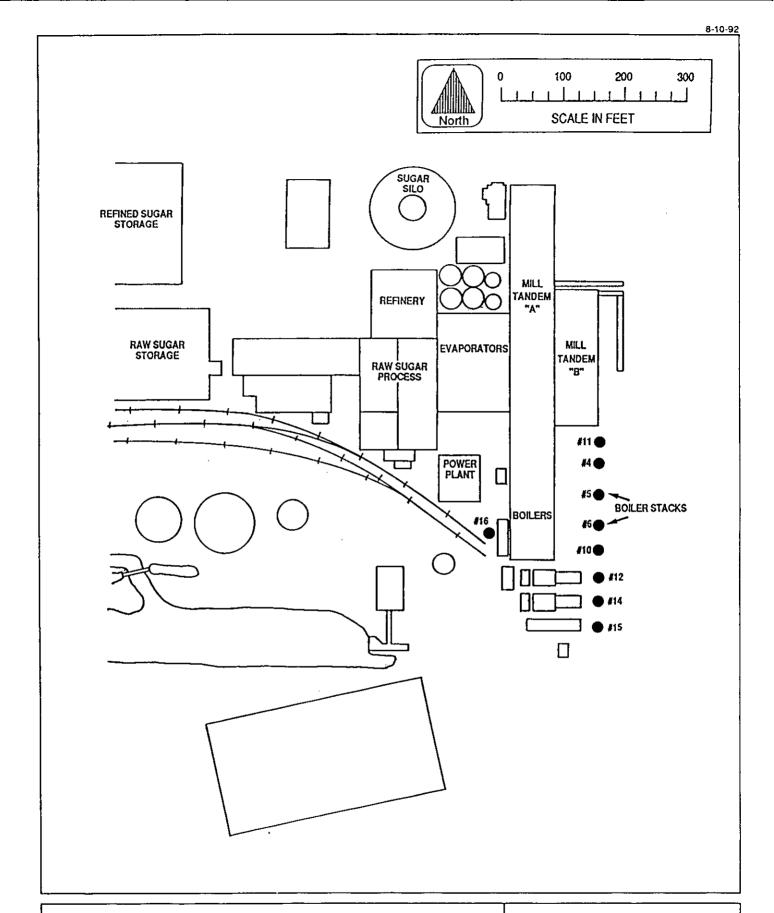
PLOT PLAN OF EXISTING OKEELANTA SUGAR MILL
